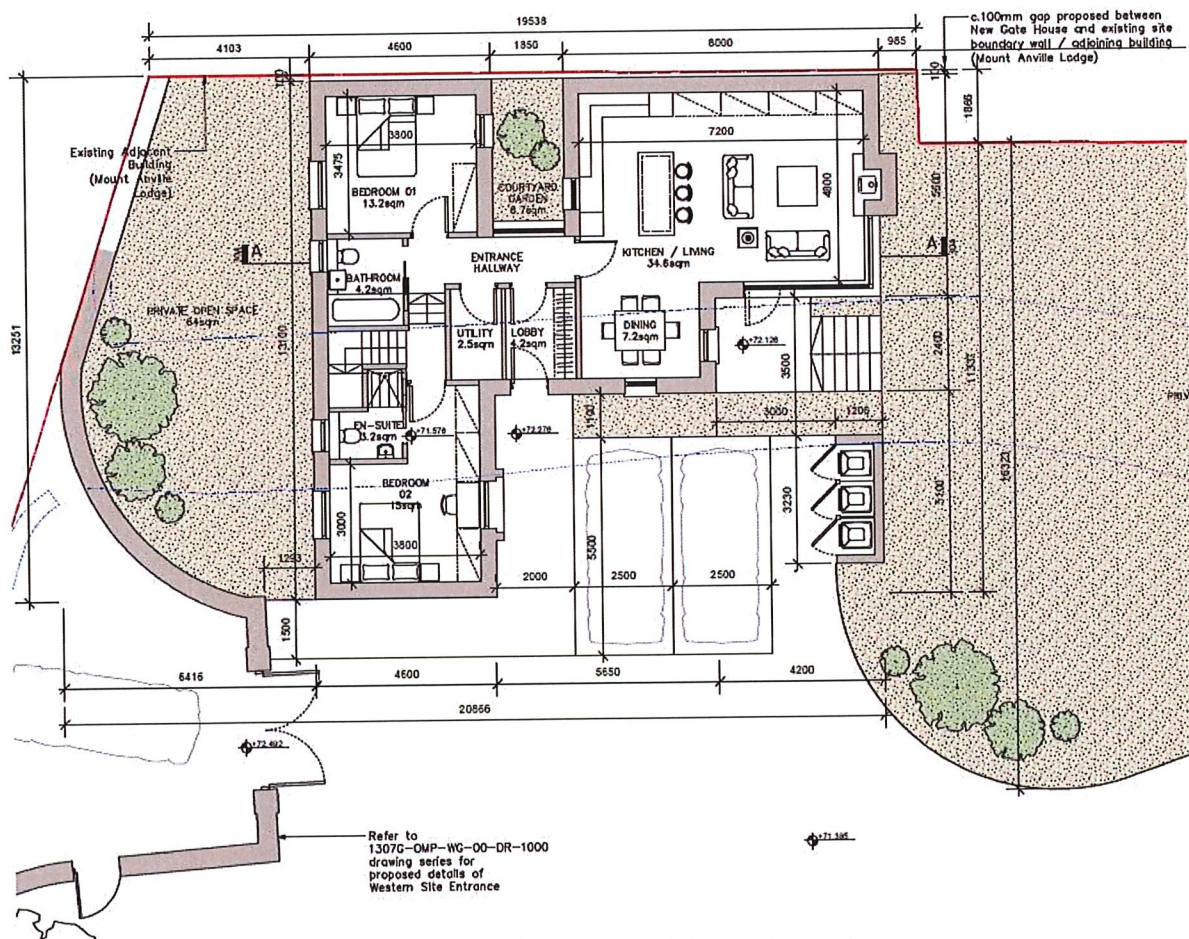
Gate Lodge, Proposed Ground Floor plan. Source: O'Mahony Pike Architects.
